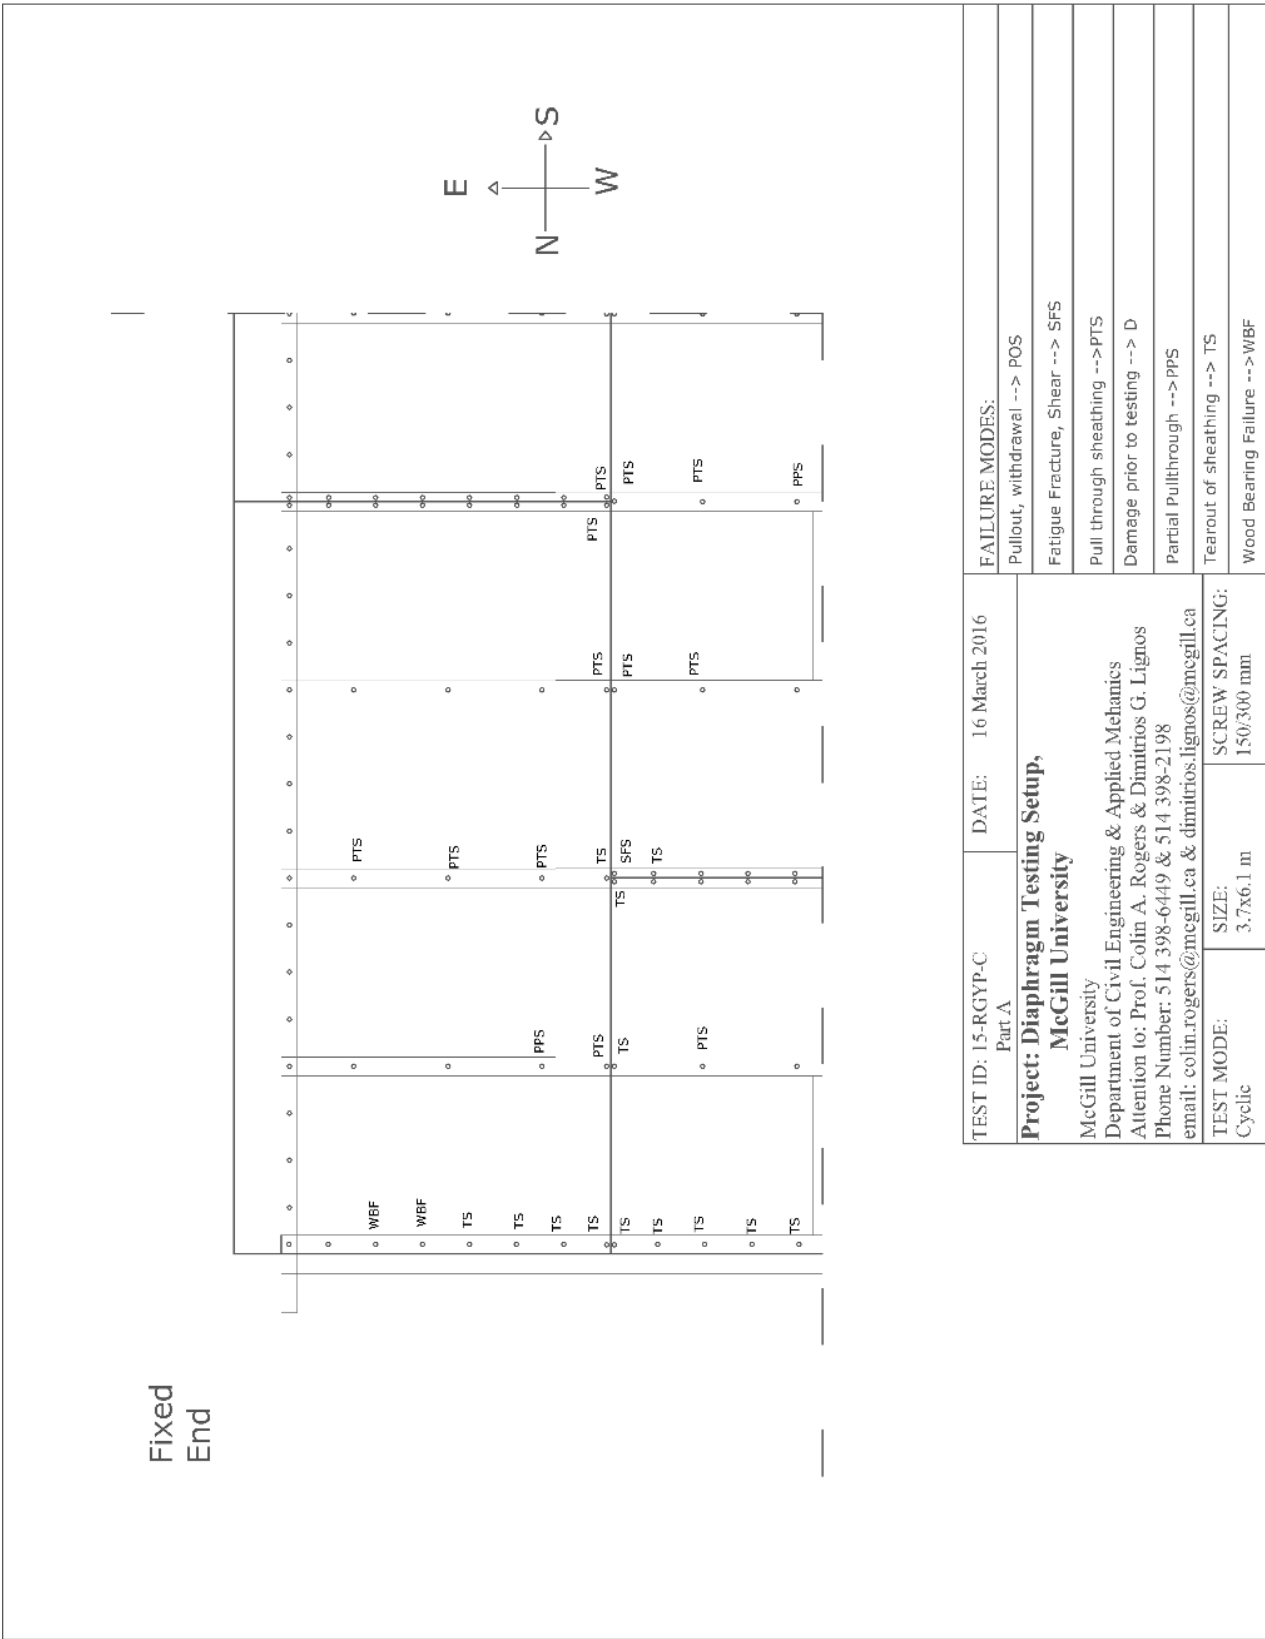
Sheathing Fastener Failure Modes Part A Specimen 15-RGYP-C
